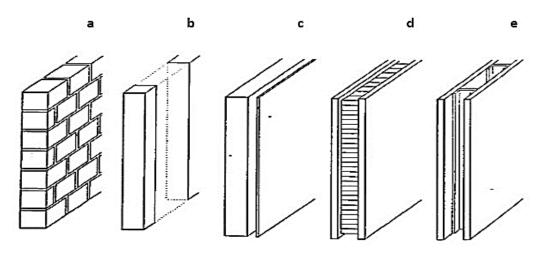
Wall Classification in terms of Construction Techniques [160]
